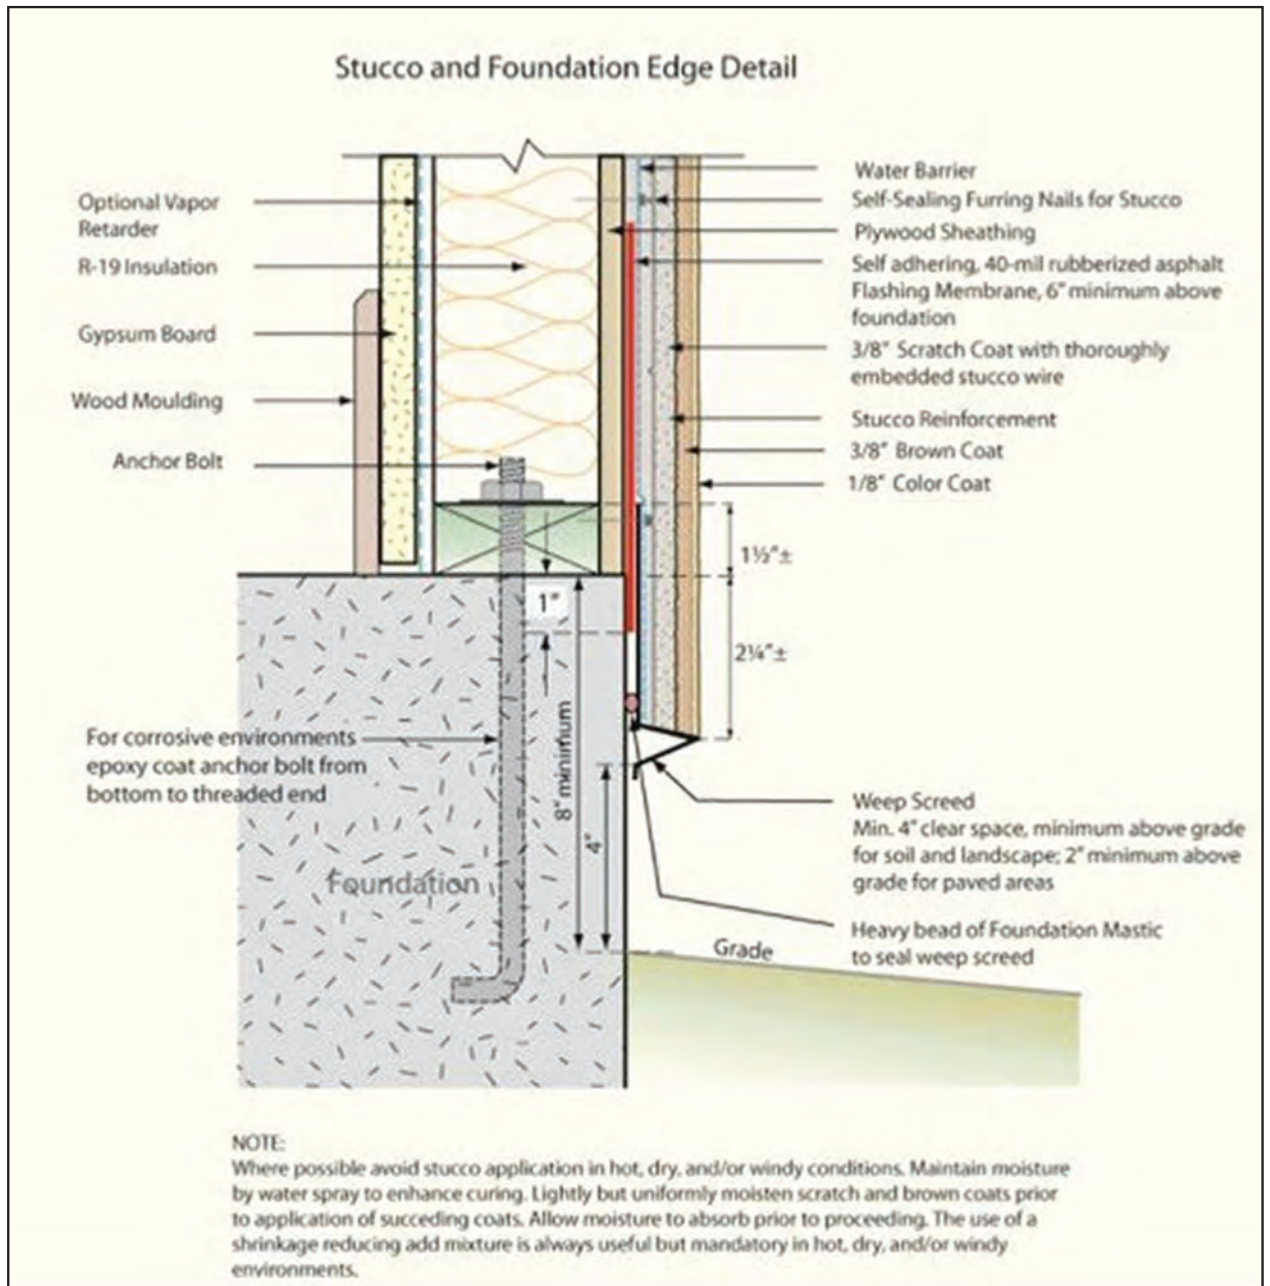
Sealing for stucco walls with offset framing and standard weep screed.
